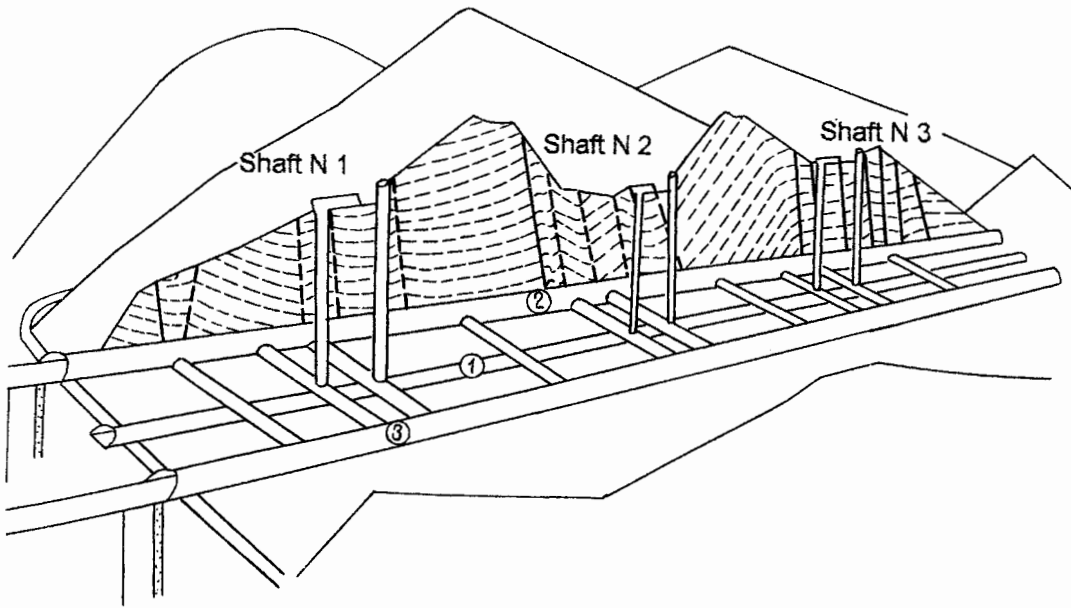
Excavation System and Geological cross-section of Ping Lin Tunnel
